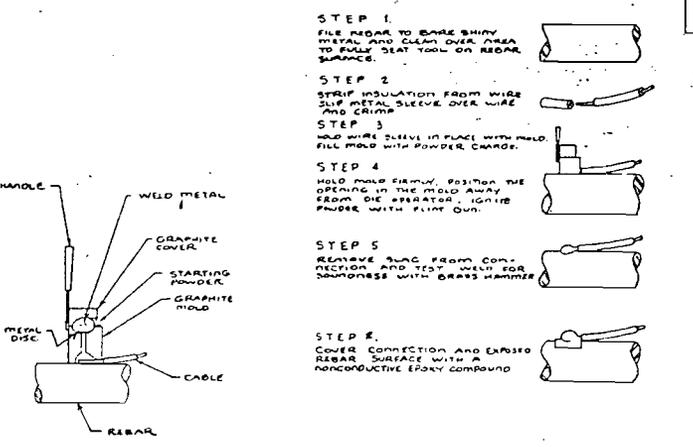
DETAIL G: REBAR PROBE PLACEMENT (TYPICAL)
